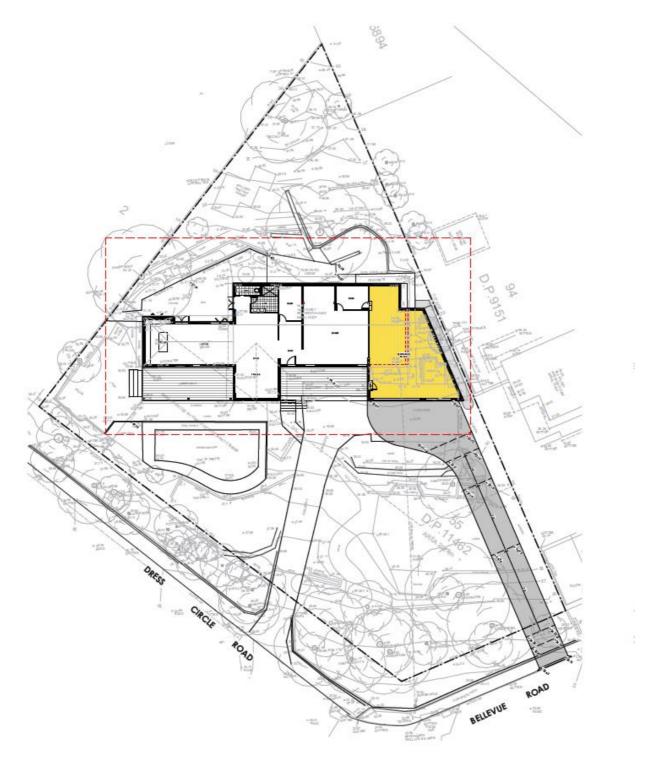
Proposed construction layout. The proposed driveway (grey) and garage extension (yellow) are highlighted. Source: Jamie King Landscape Architect, 2020.
